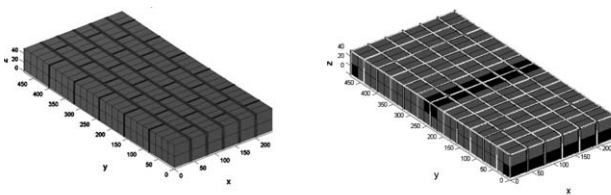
Boundary condition and loading of the masonry wallet for out of plane test
